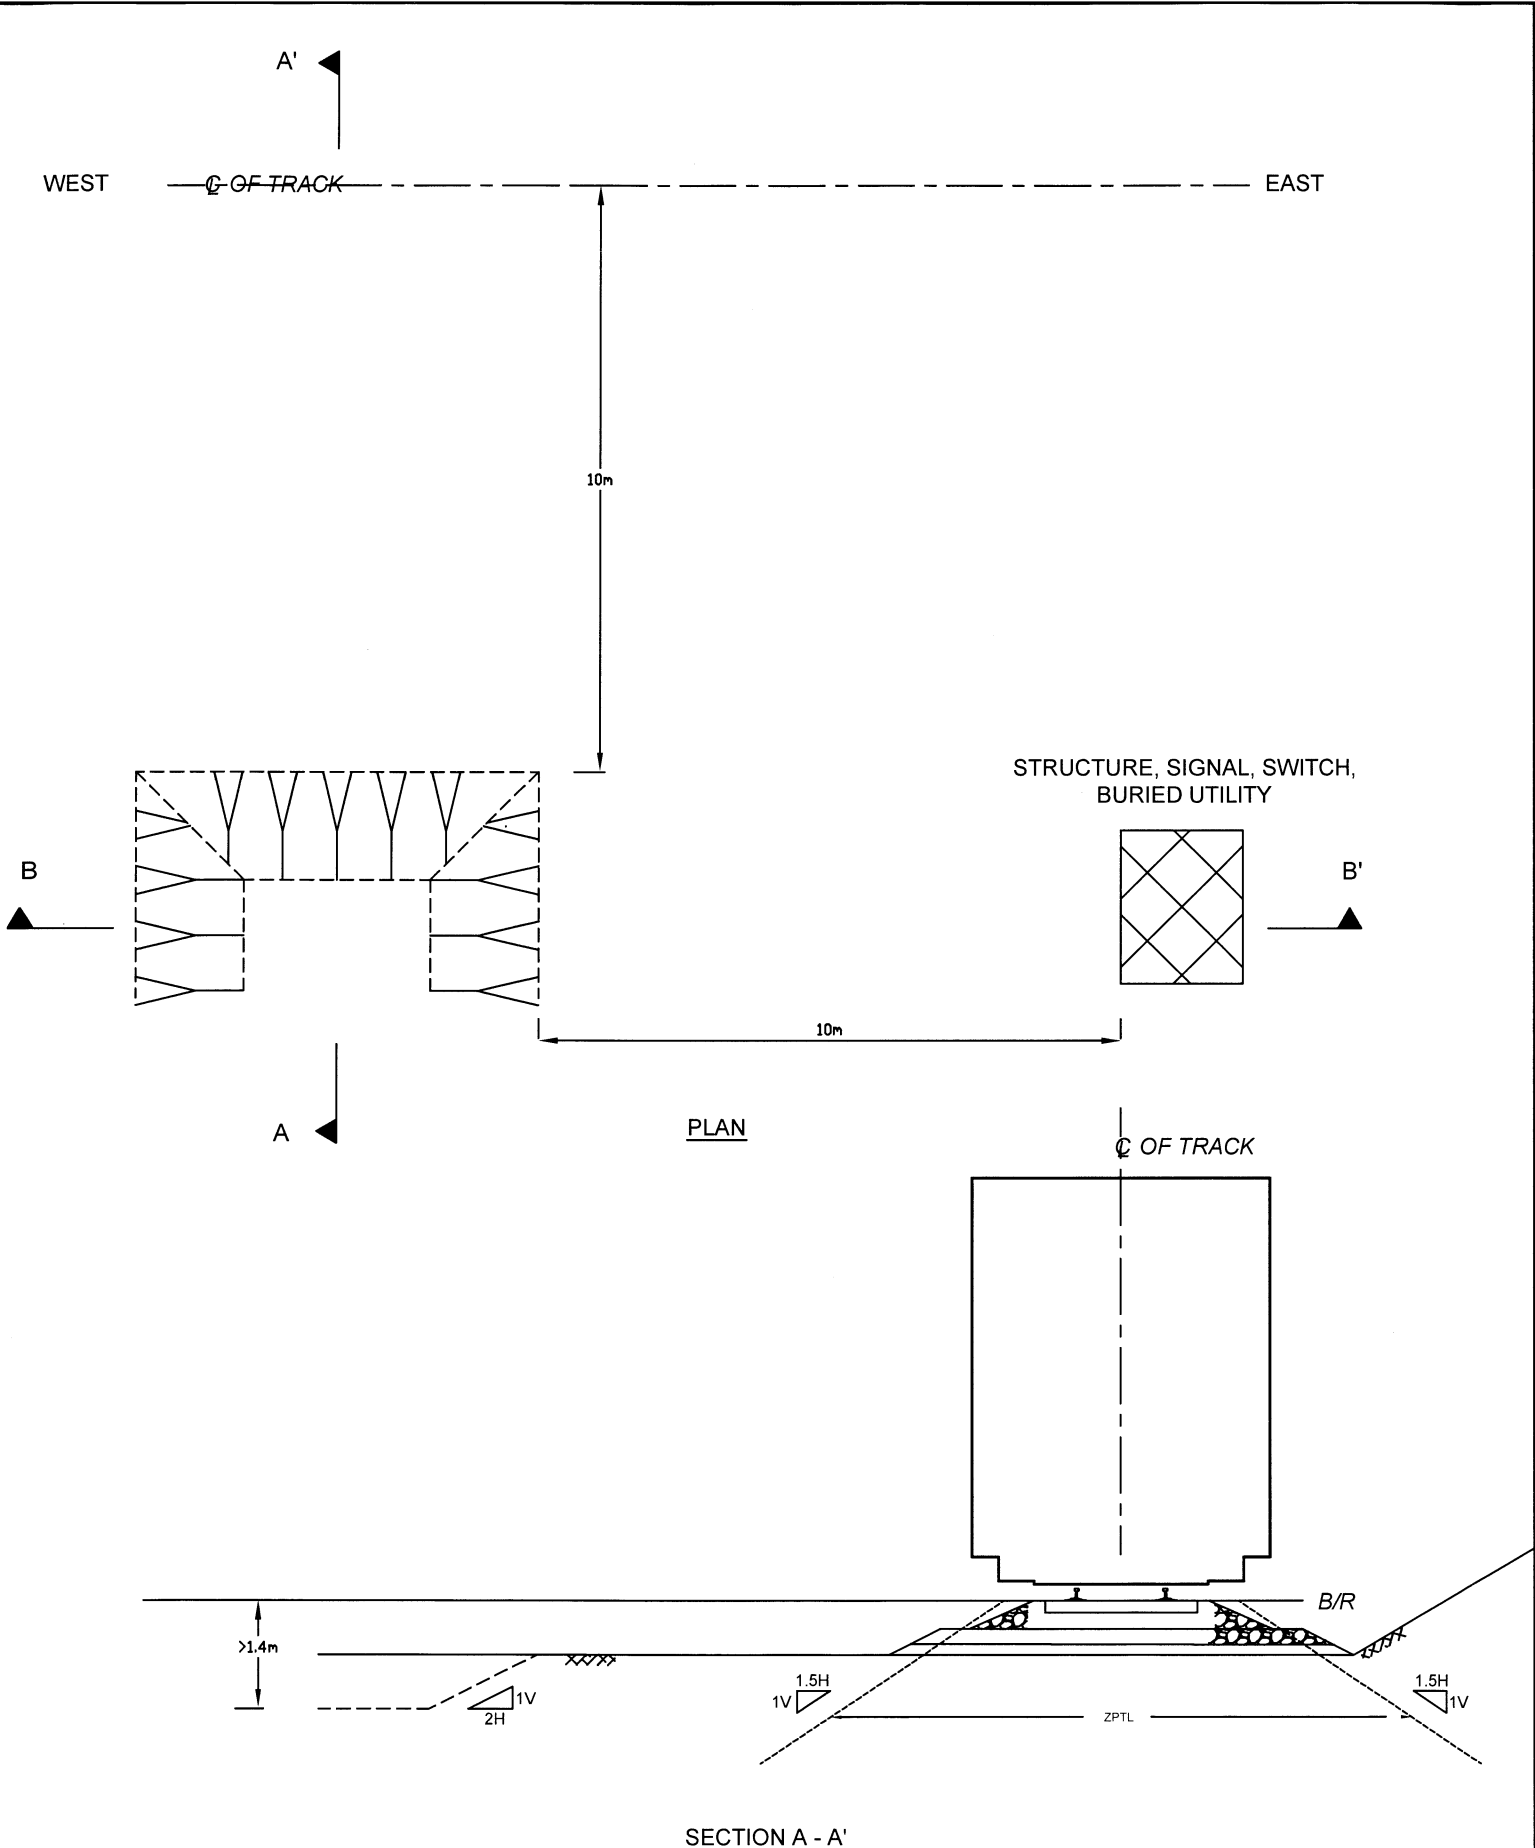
SECTION OF TRACK PERPENDICULAR TO THE CENTER LINE OF PROPOSED EXCAVATION
